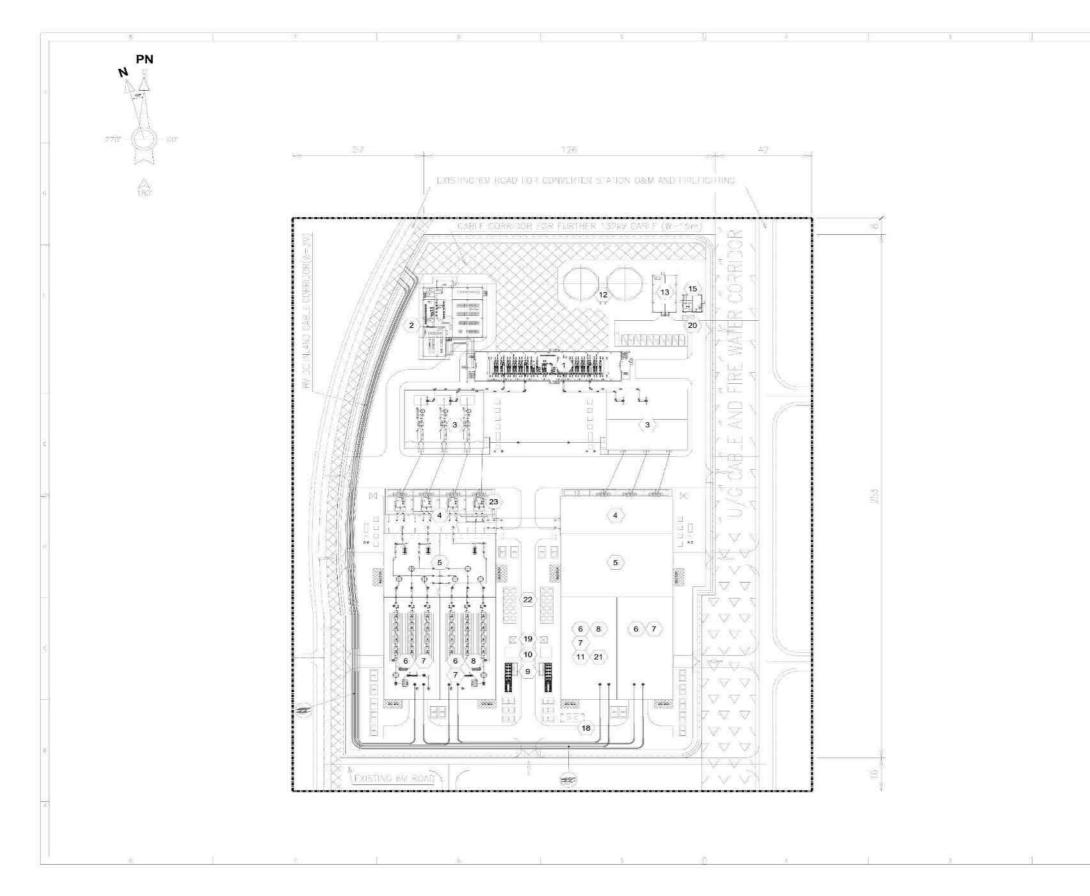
Proposed onshore elements layout at Al Ghallan Island (Route 1)
